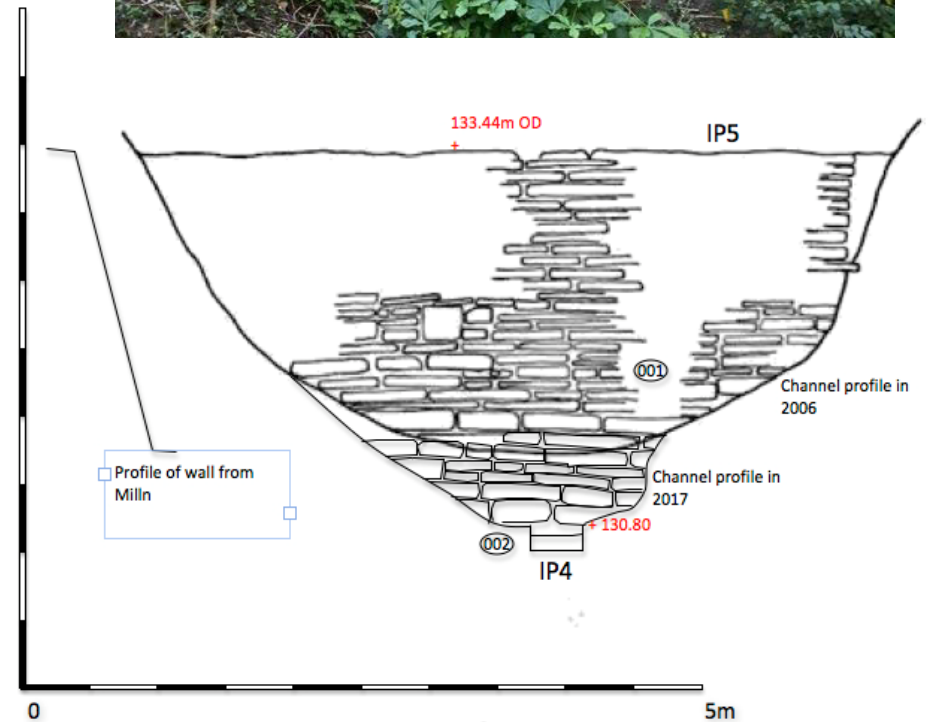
IP4 Elevation of retaining wall, Milln 2006 with additions
